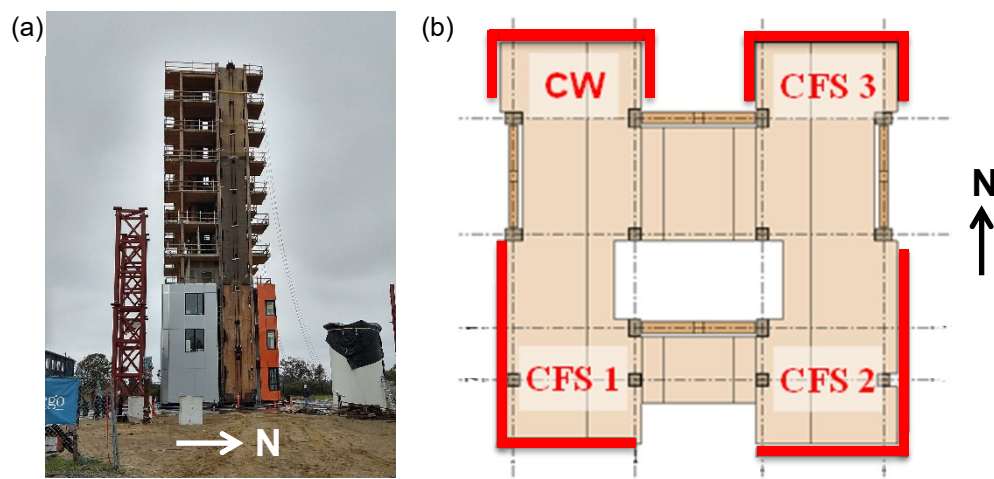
(a) 10-Story building specimen and (b) floor plan showing the platform-framed (CFS 1), balloon-framed (CFS 2), and spandrel-framed (CFS 3) subassemblies as well as a stick-built glass curtain wall (CW)
